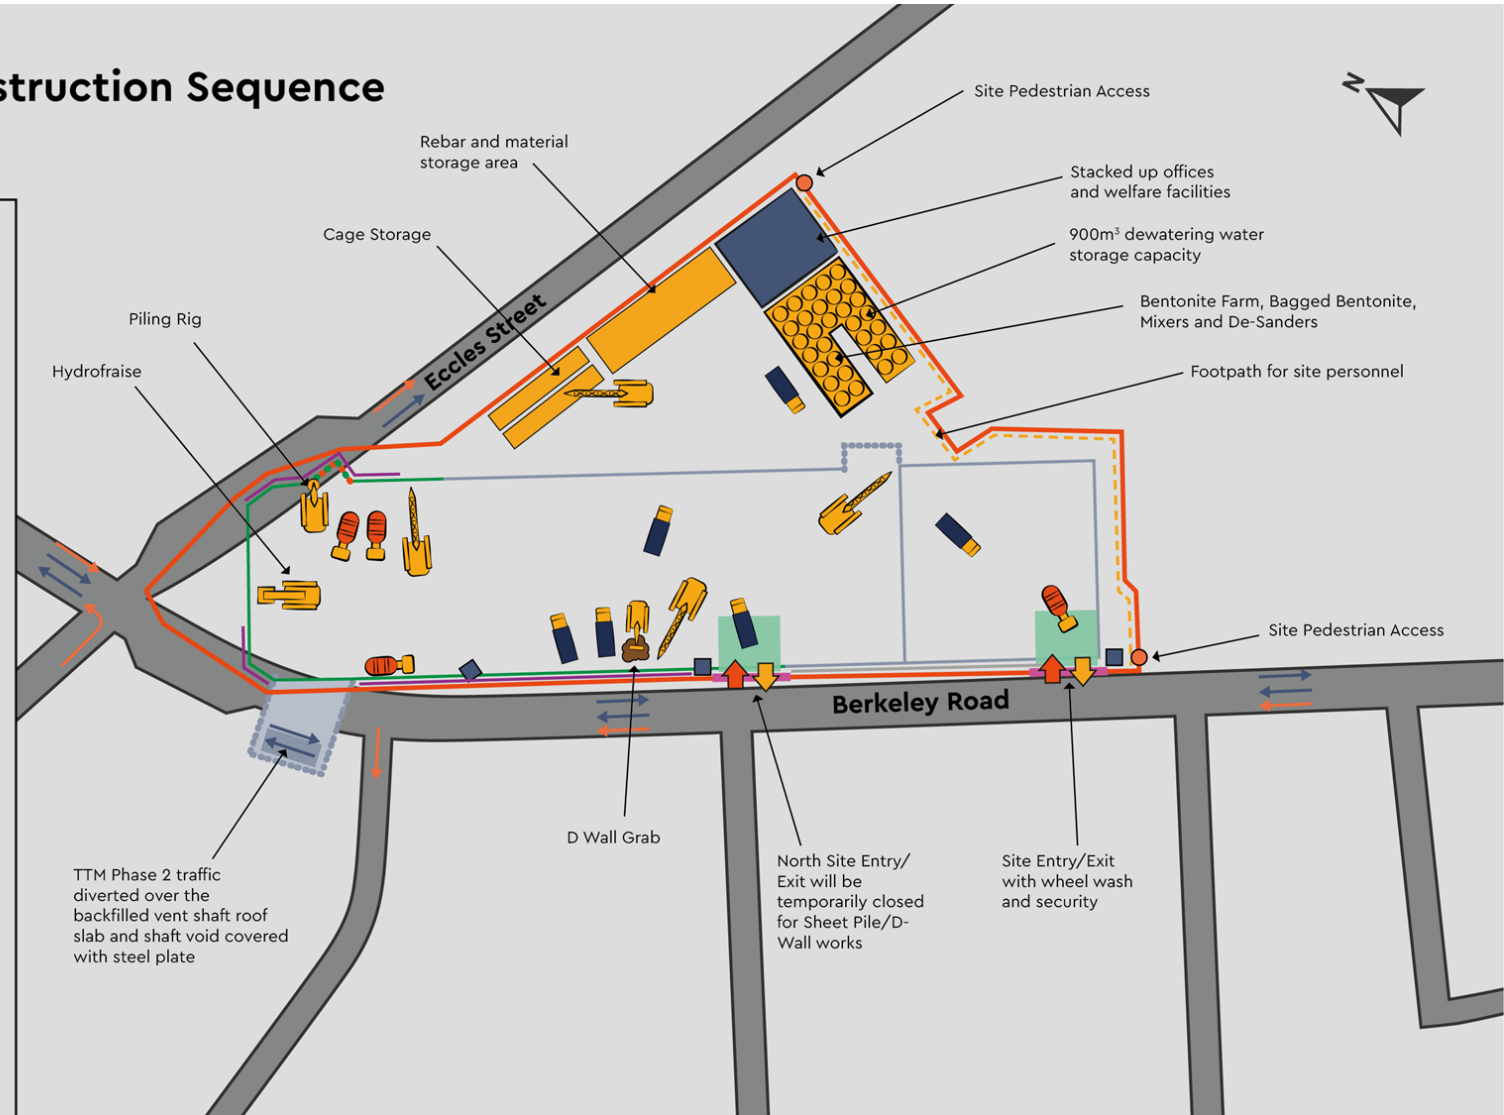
Mater Station Stage 4 -Roof Slab Construction
